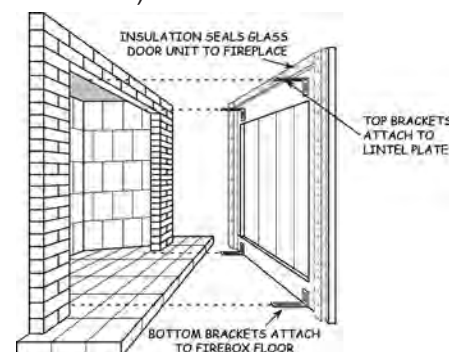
ATTACHING GLASS DOOR UNITS
